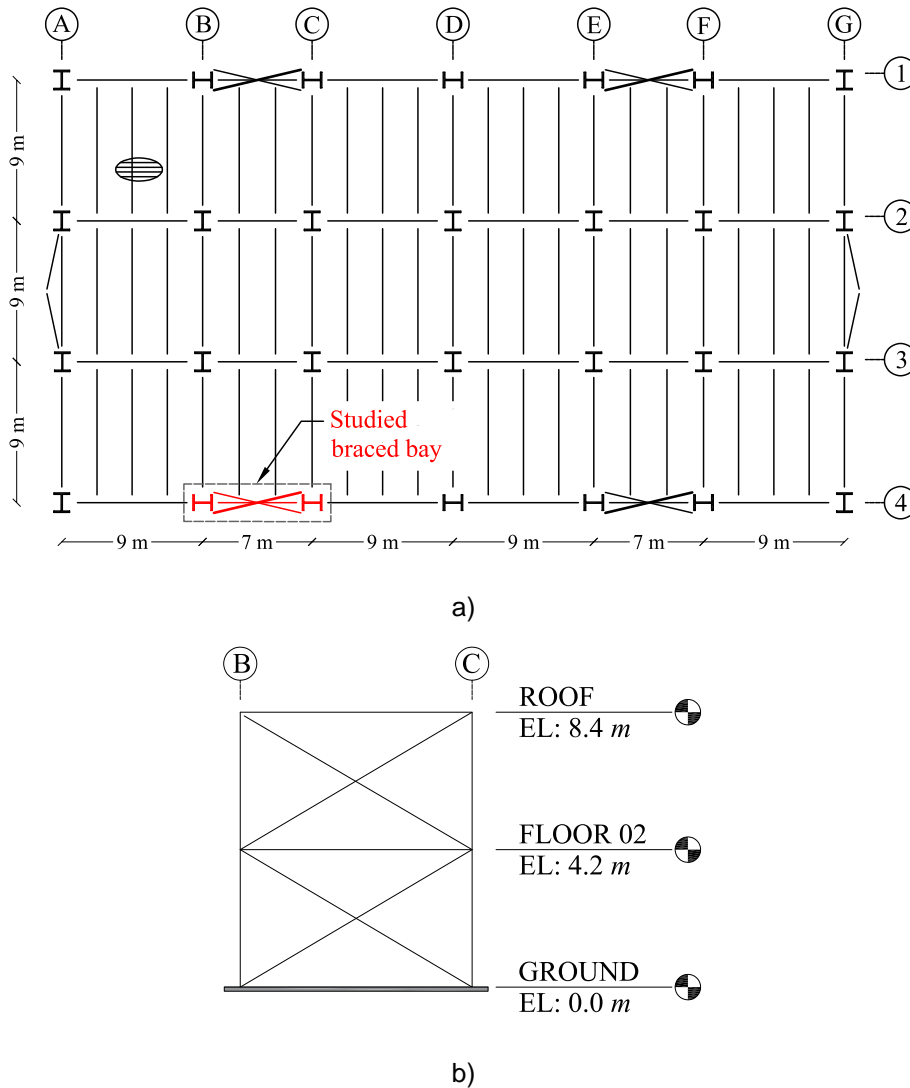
Studied 2-storey CBF building: (a) plan view; (b) elevation view
